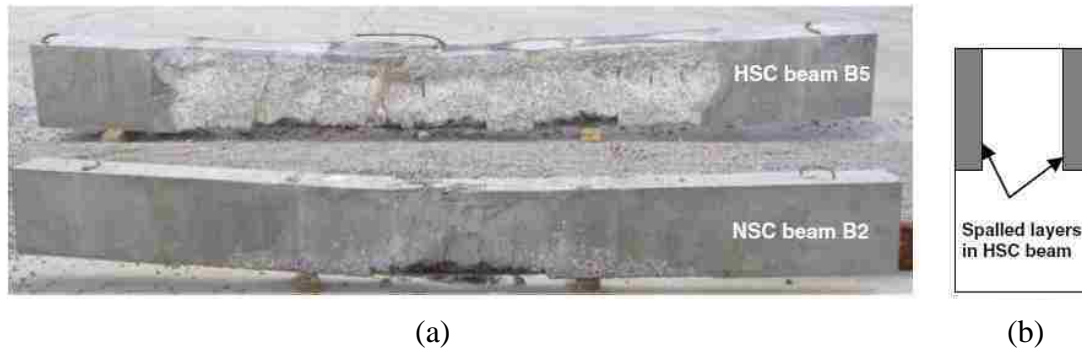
Experimental spalling results: (a) Spalling in NSC beam B2 and HSC beam B5; and (b) cross section showing spalling in HSC beam.
